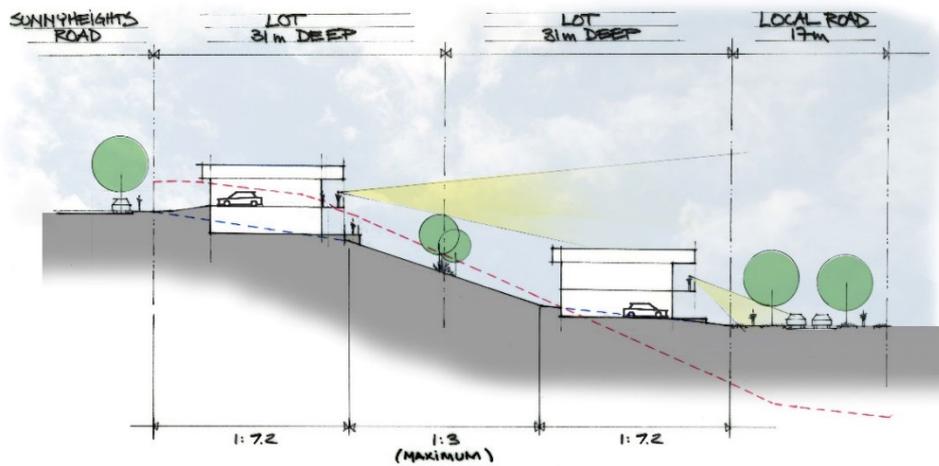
Block cross section, showing lots slopes at 1:7.2, transition slopes at 1:3, back boundary planting for privacy, distant views, and passive surveillance over street.
